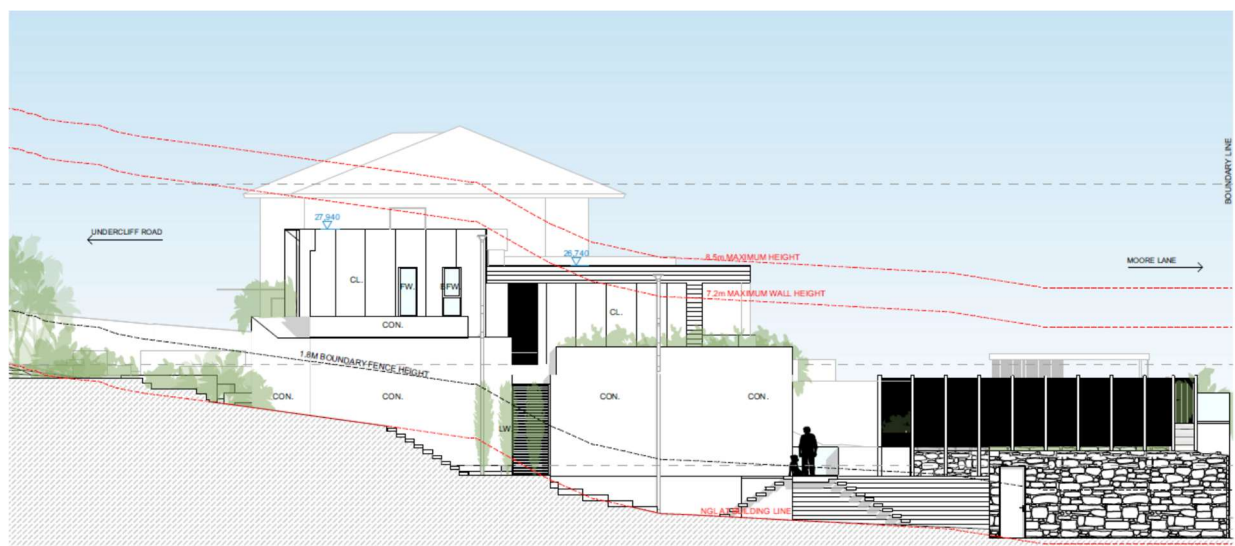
Extract south elevation showing relationship of design with neighbouring building to the north east
